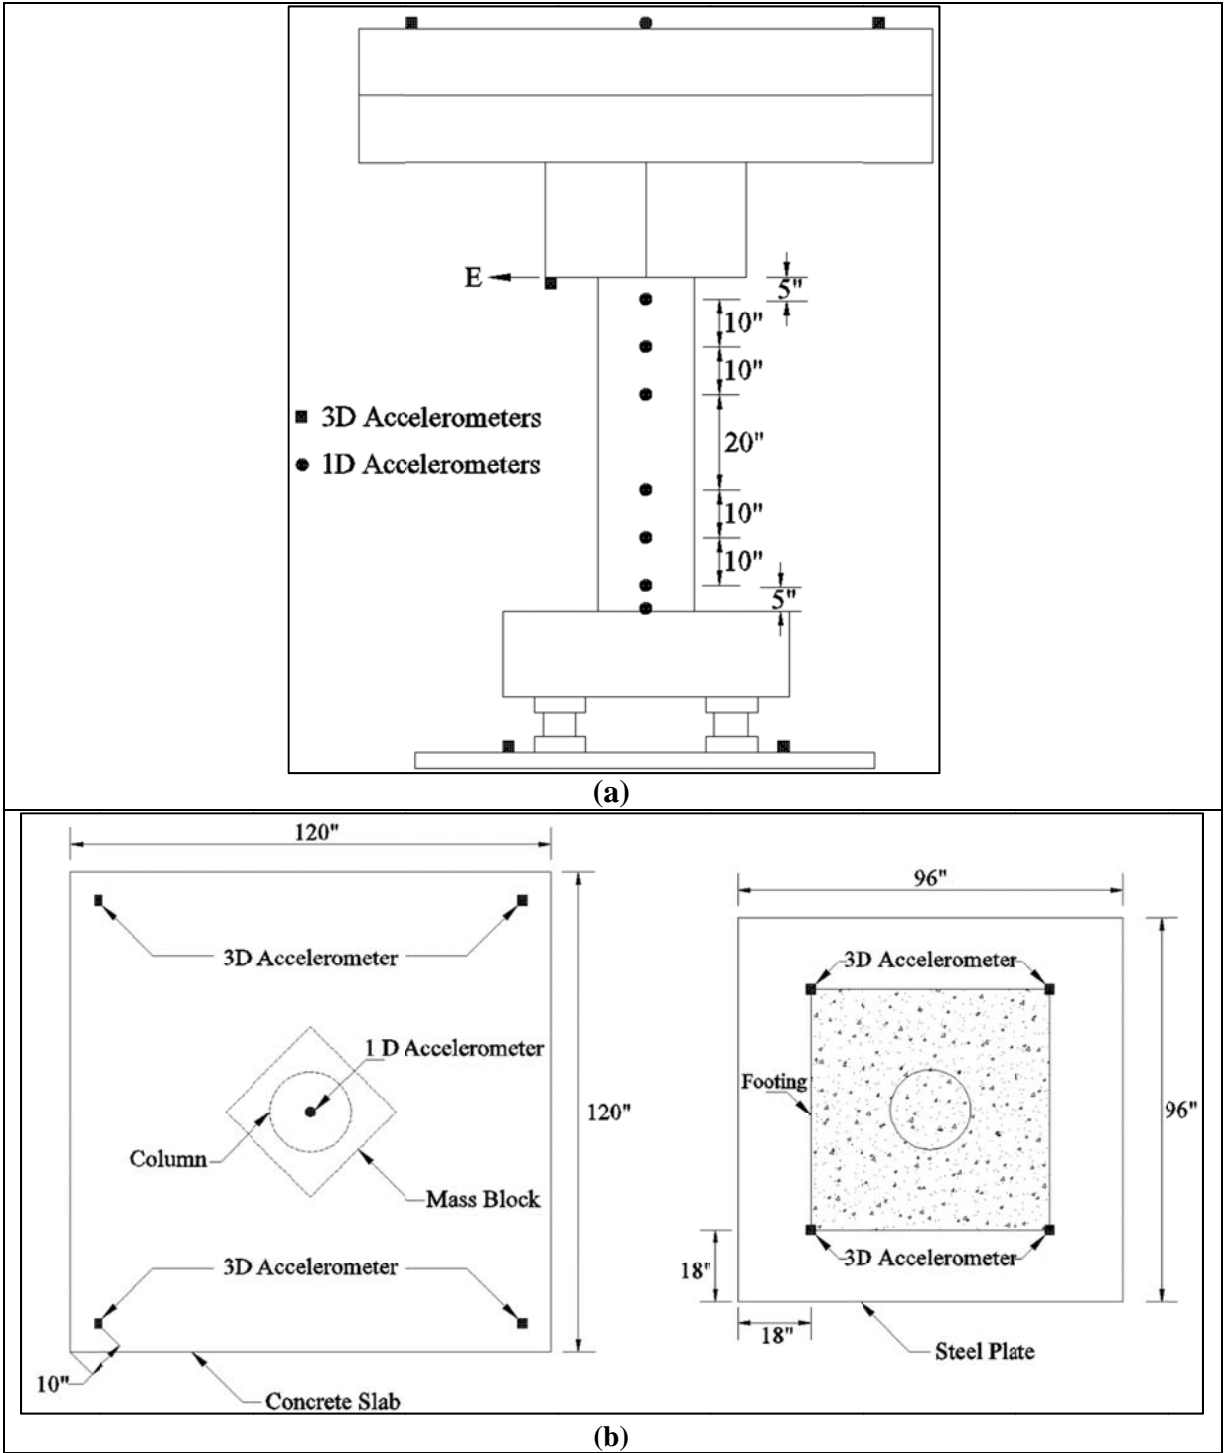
Accelerometers installed on the test specimens: (a) elevation view; (b) top view of the concrete slab and the steel plate.
